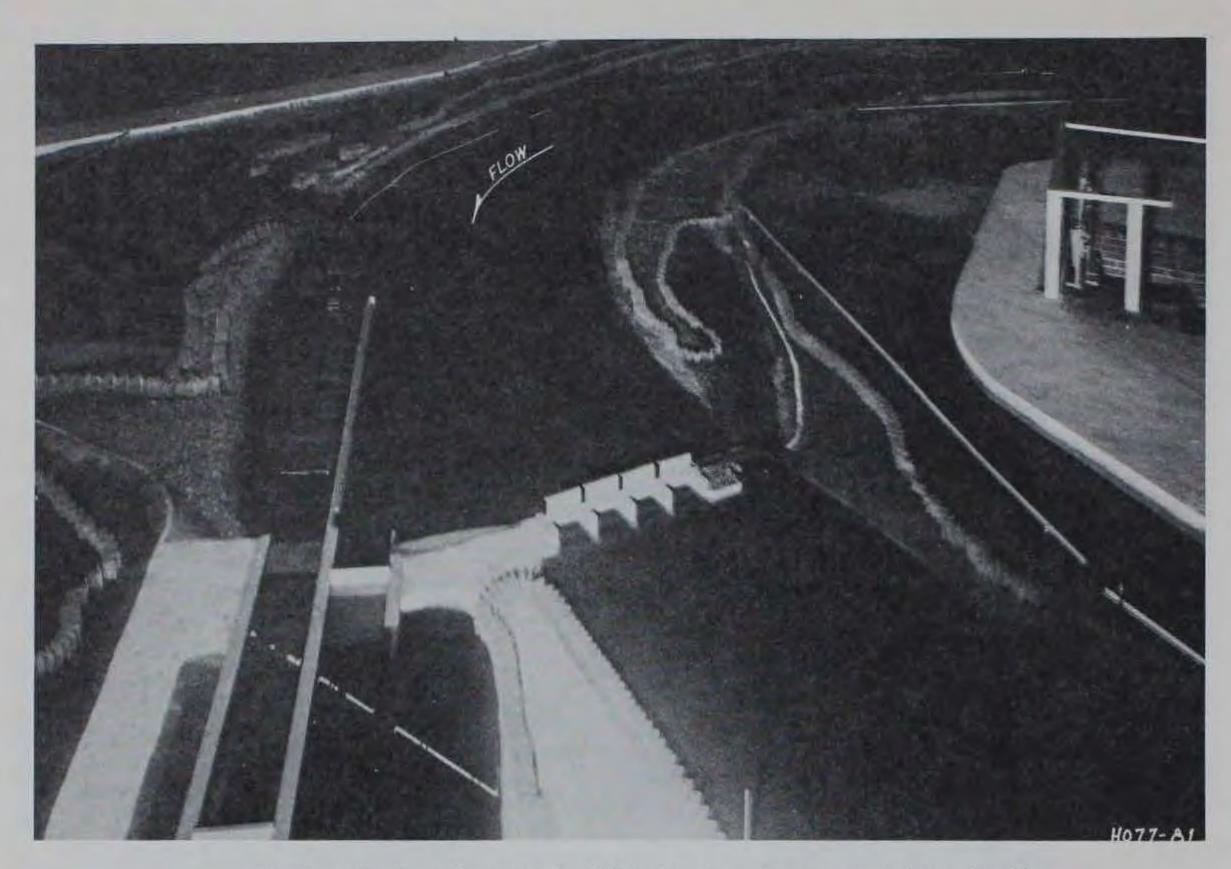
Plan A-modified; discharge 36,000 cfs, upper pool el 674.0. Surface currents in approaches to lock and dam. Note flow through the ice gap in upper guard wall
